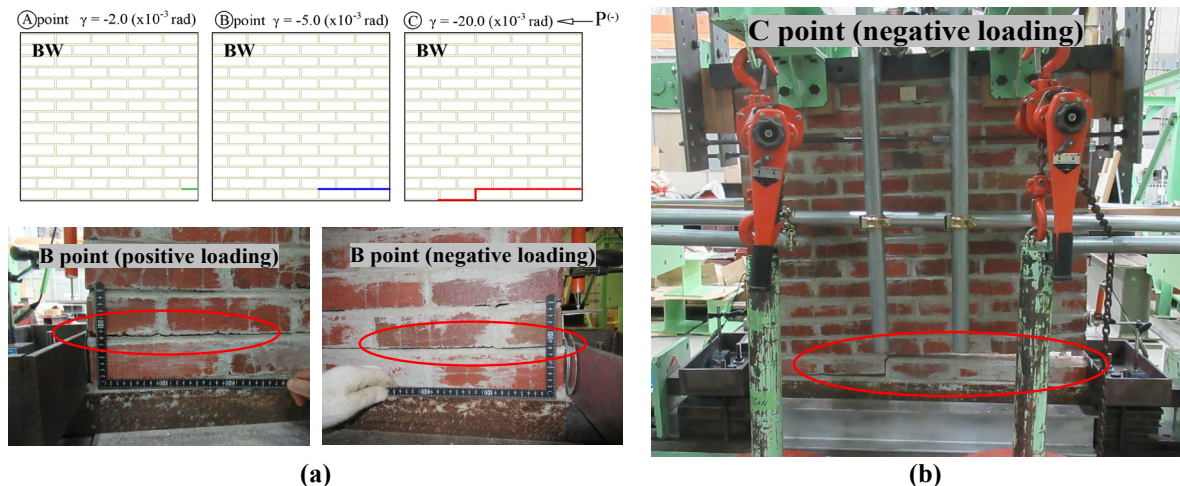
Failure and crack pattern of BW wall. (a) Scheme of the crack pattern and photo of crack at uplift (B point); (b) Photo of failure at maximum load.
